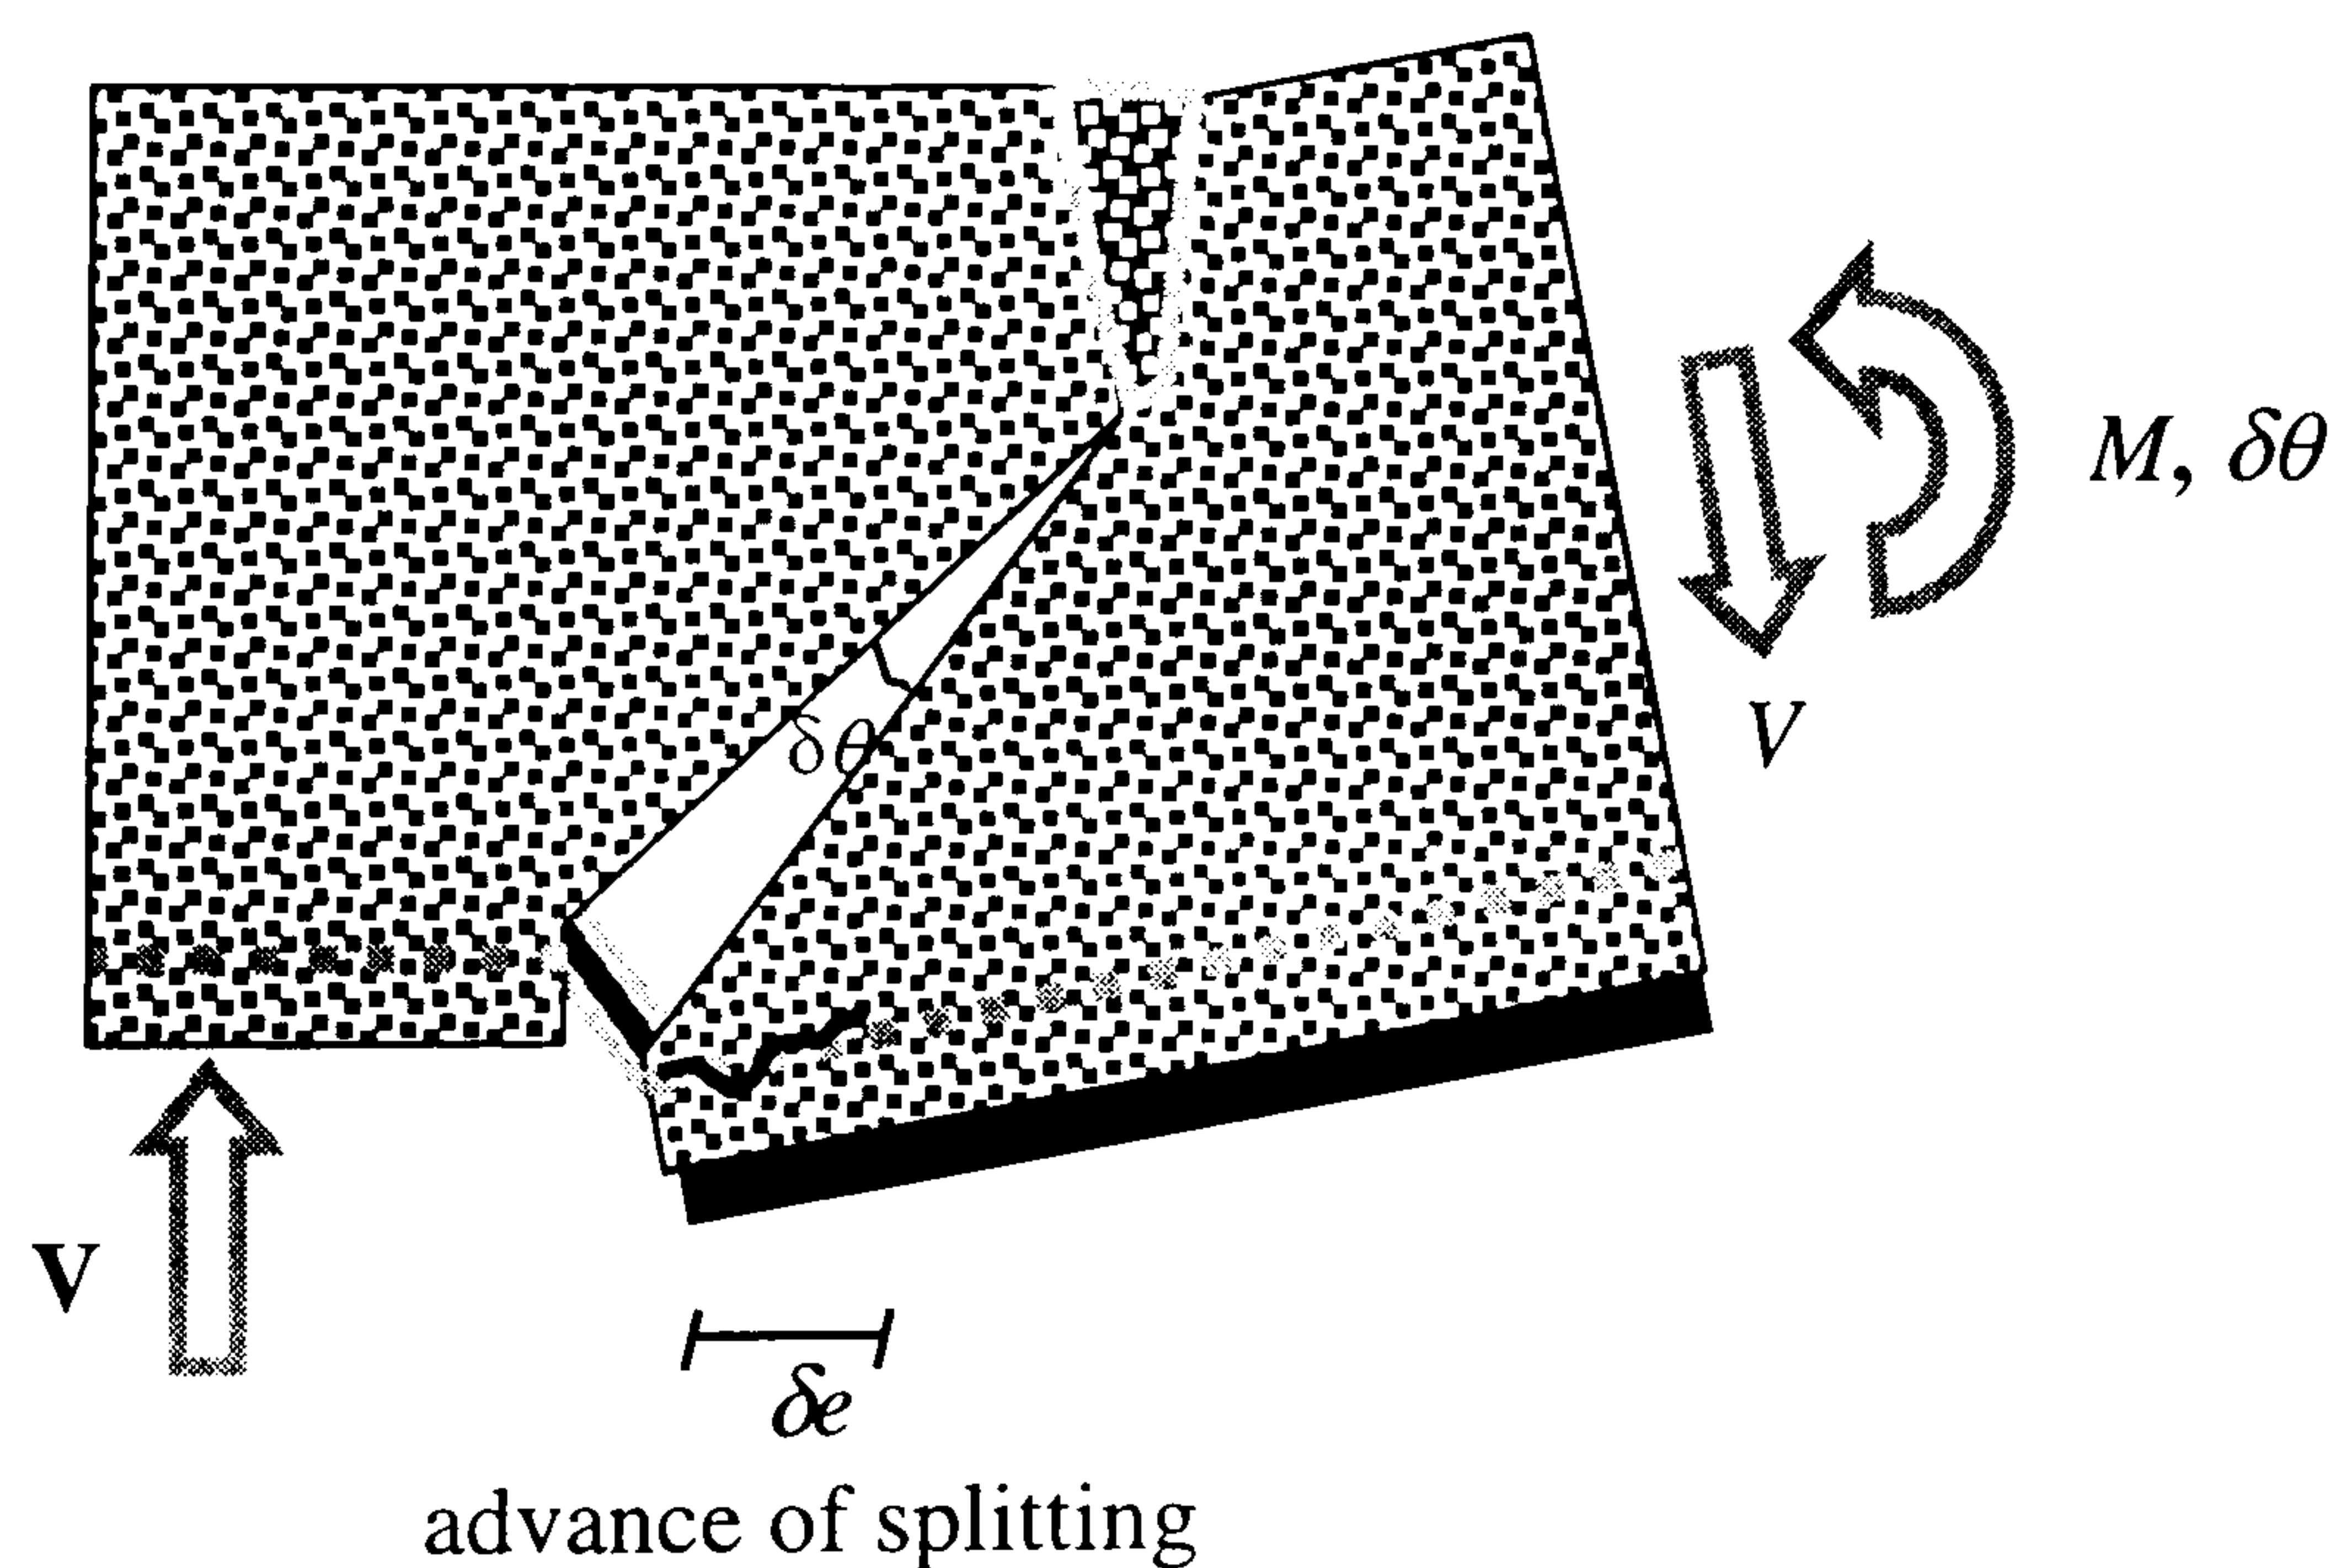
Failure mechanism of the plated beam failing in flexural shear mode
